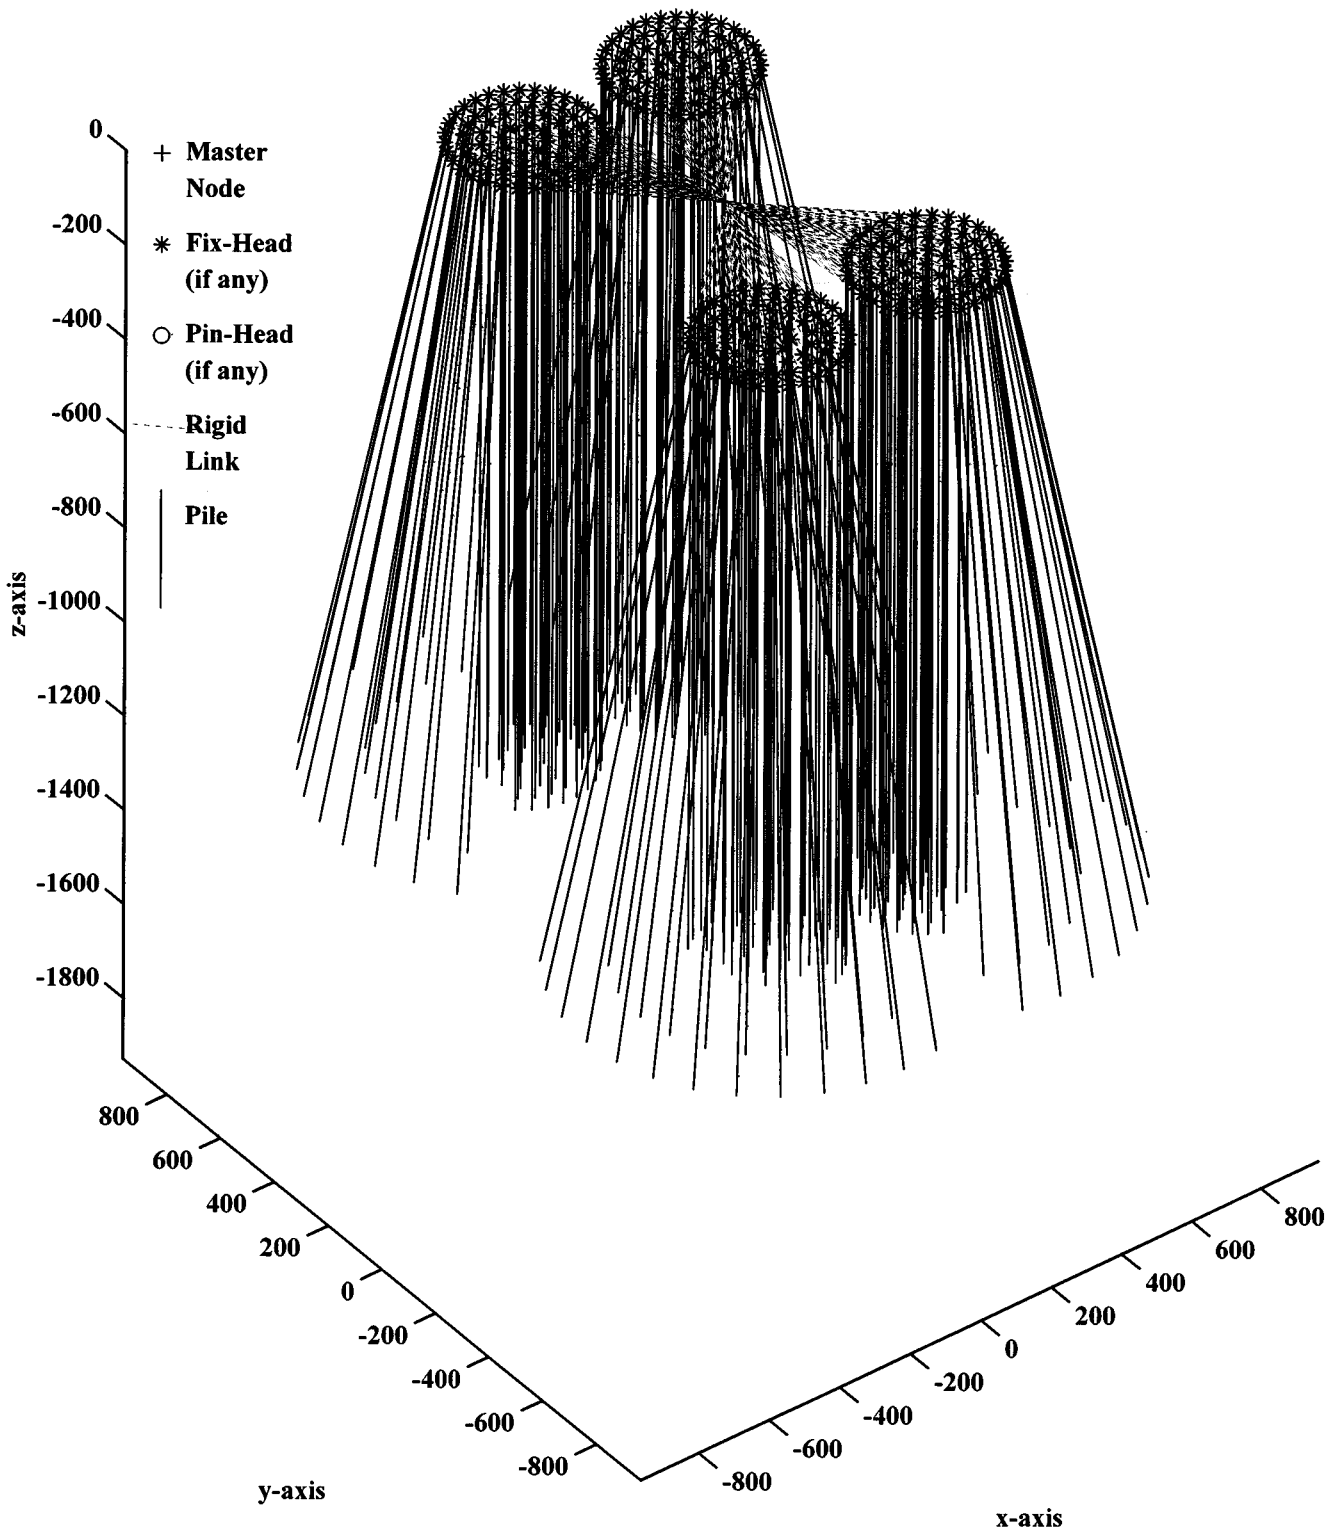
Isoparametric view of the pile group model at Richmond-San Rafael Bridge.
